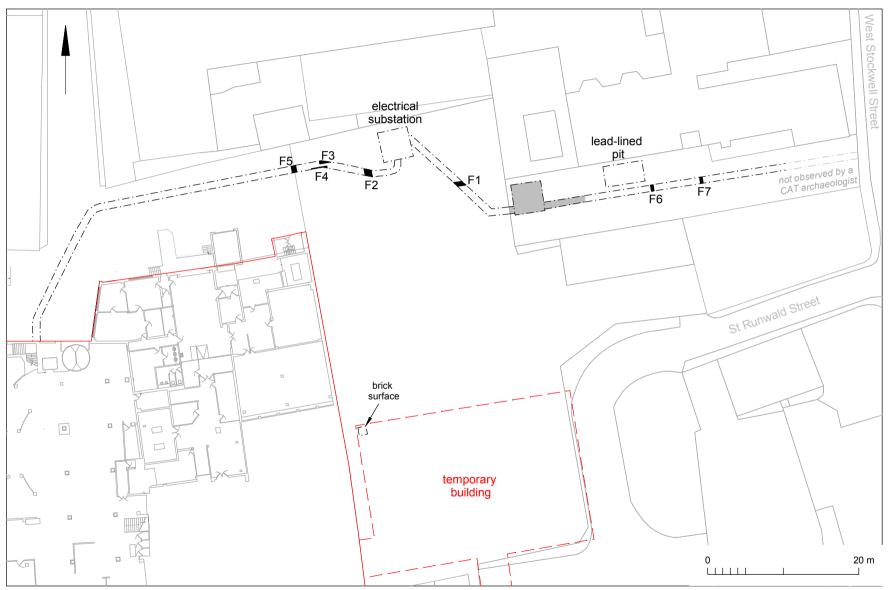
The results of the watching brief with the substation and stretch of cable trench built into the new slope shaded grey.
